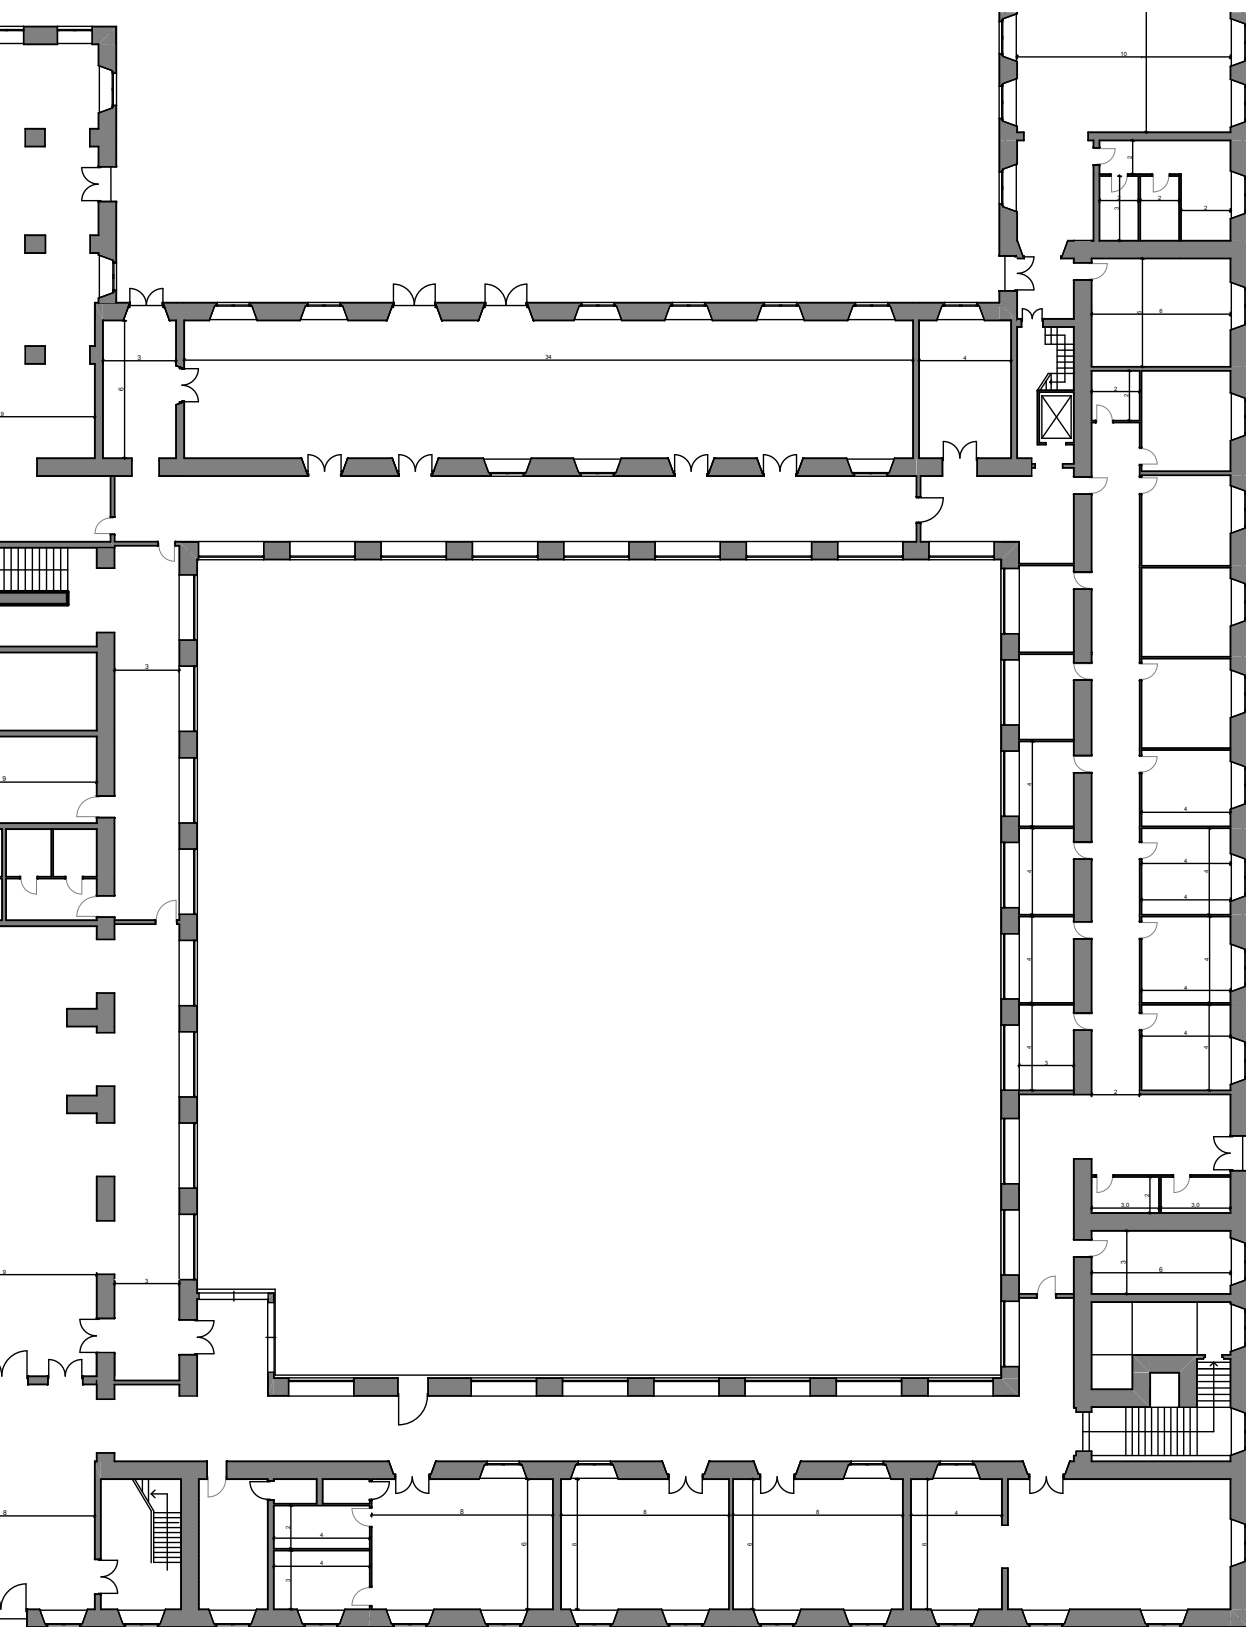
Ground floor plan of the Chiarugi Pavilion project.
